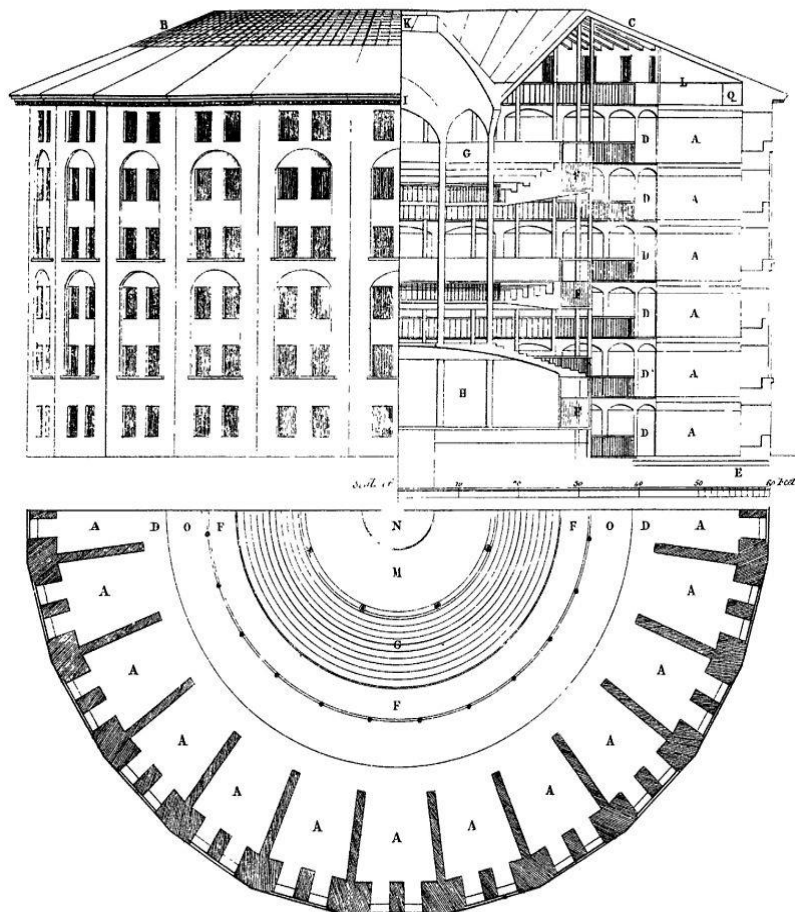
Depiction of a building designed through the panopticon principle. From “Plan of the Panopticon,” by J. Bentham, 1791b
